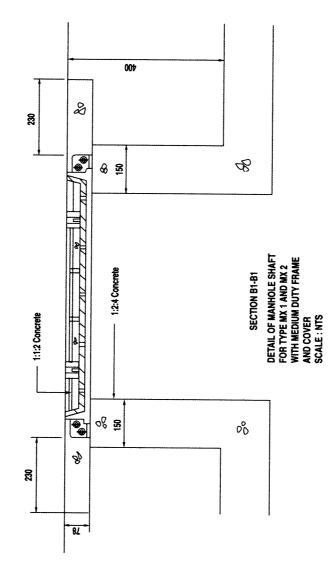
MANHOLE DRAWINGS - TYPE MX2
